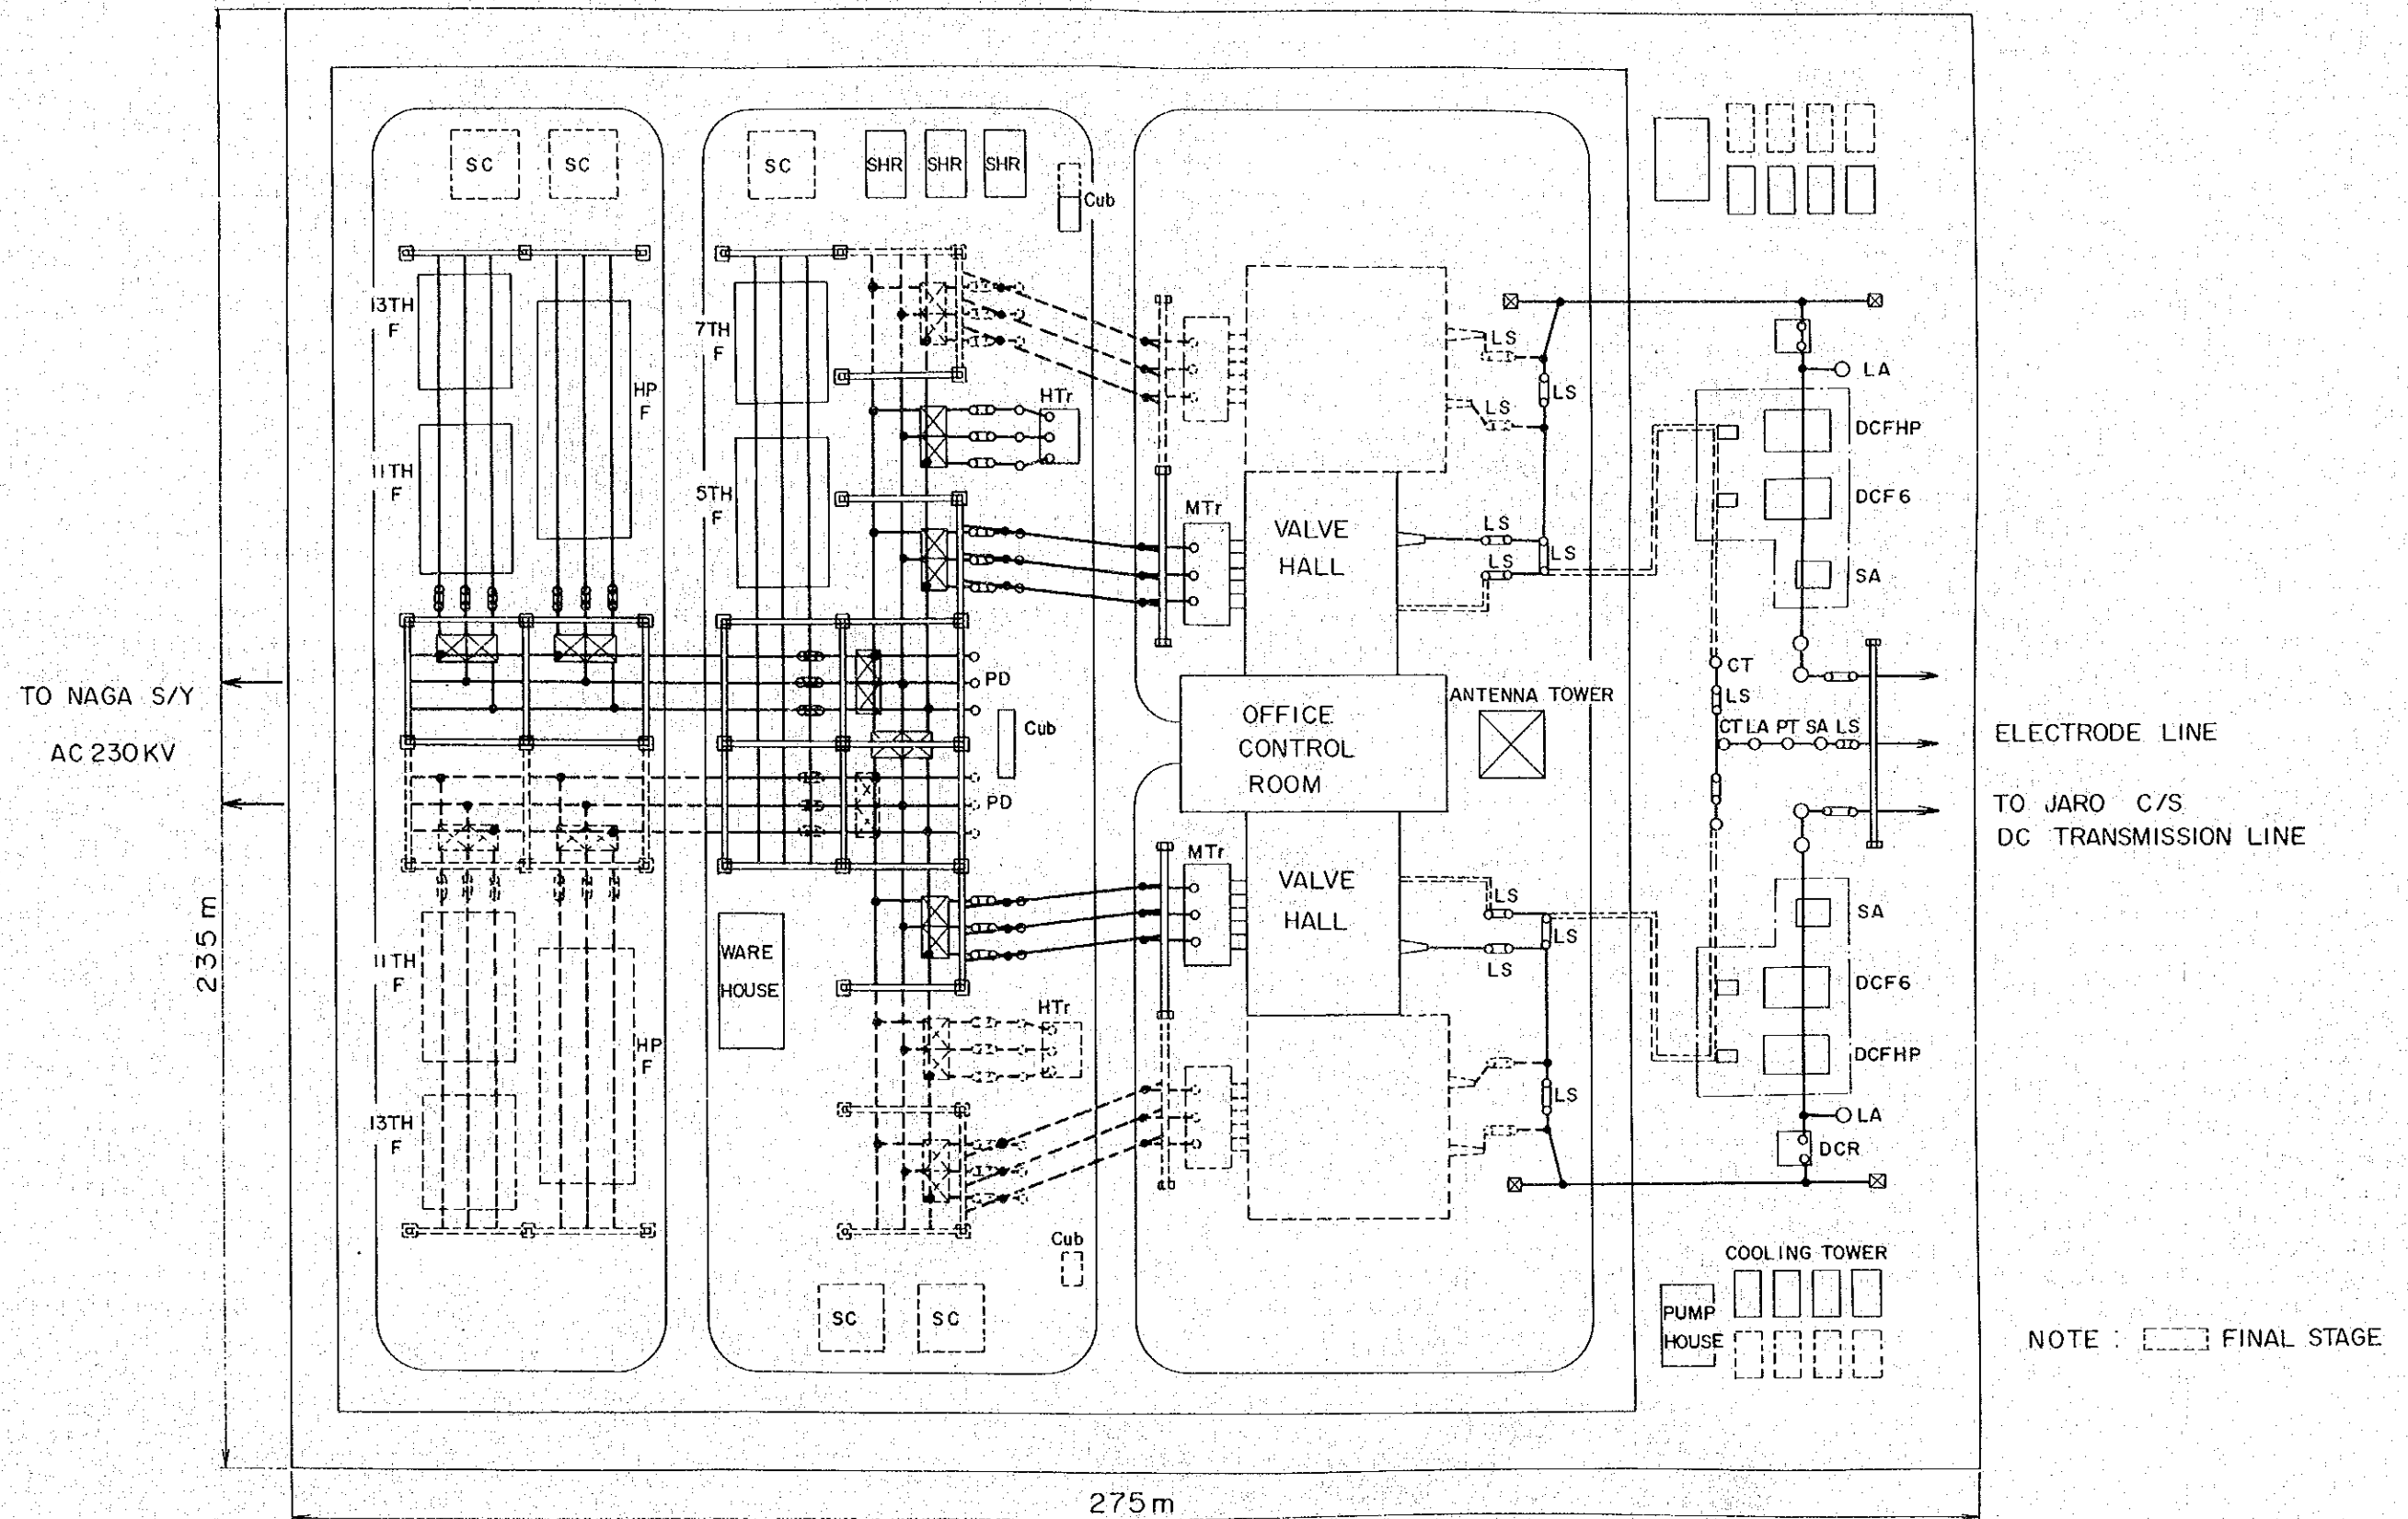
LAYOUT OF NAGA CONVERTER STATION (FIRST STAGE)
